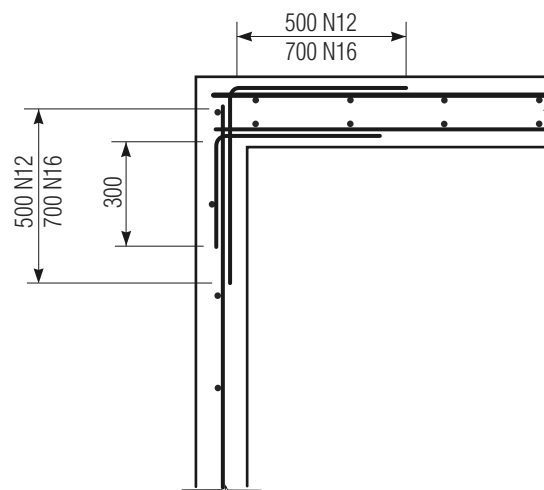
This figure shows the corner detail between a wall with a single layer of reinforcement and a wall with two layers of reinforcement to achieve a moderate degree of moment capacity at the corner.
